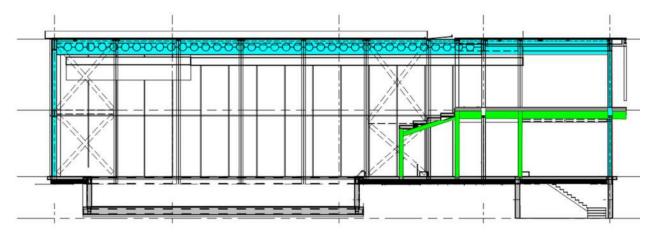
Structural Framing Concept – Long Span enclosure (blue) over traditional framed floor structures (green)
